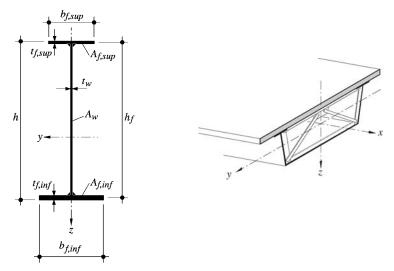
Axis convention and notations for a plate girder cross section and a bridge.
